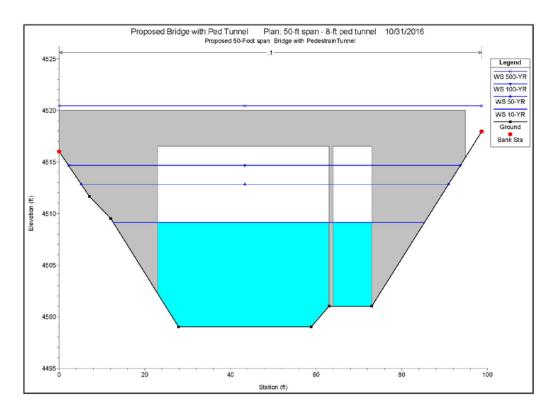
Cross-section at RS 4+00 of proposed bridge with shared use path tunnel using the existing abutment as the channel side tunnel wall. 100-year WSEL is 4514.67 and lower chord of the bridge deck is at 4516.5 for a freeboard of 1.83 feet.
